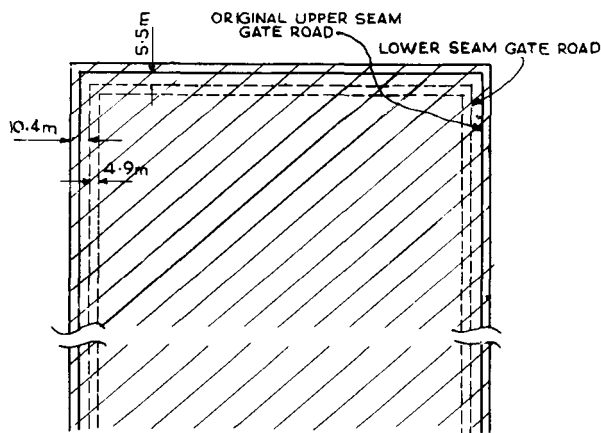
Typical lower seam panel layout. Lower seam gate roads well within periphery of top seam goaf.
